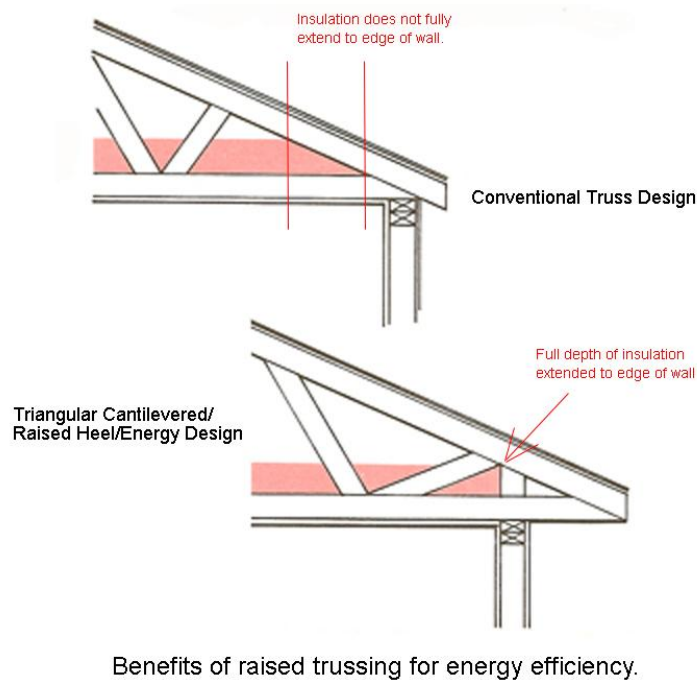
Ceiling insulation in conventional truss and truss with raised heel
